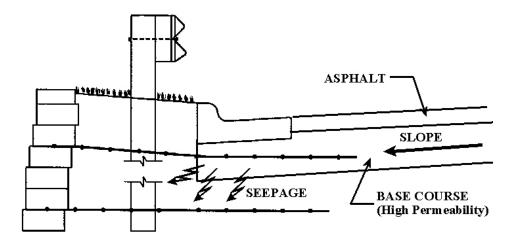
Example of undesirable water seepage through pavement due to deficient grades (Collin et al., 2002)
